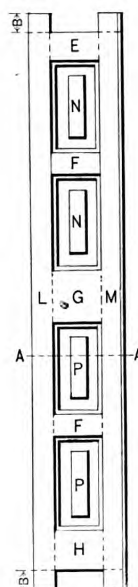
Elevation of a Shutter.—Scale, $\frac{3}{4}$ Inch to the Foot.
